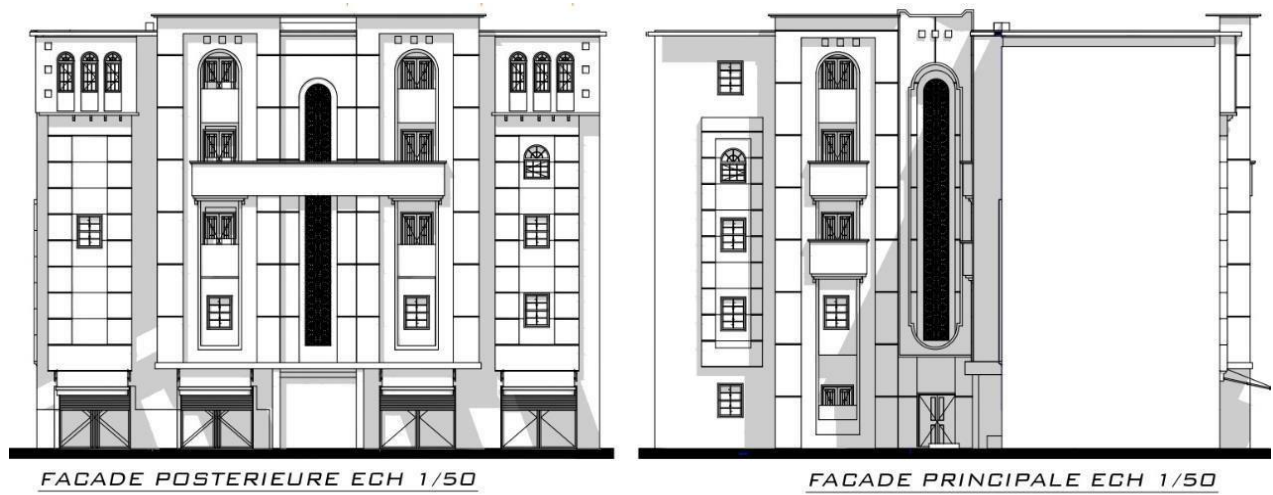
Fronts of Corner Block (Source: design office Nebar Omar +Author treatment , 2025).
